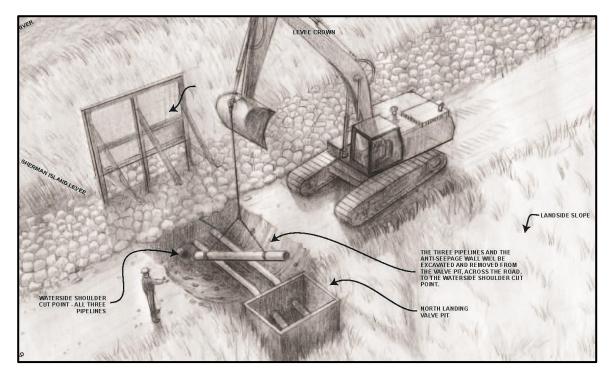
Waterside Terrestrial and Shoreline Segment Excavation and Removal
